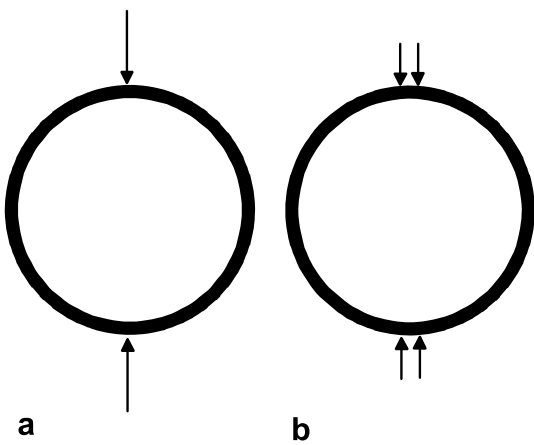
Two-point loading and four-point loading on the liner. (a) Two-point loading and (b) Four-point loading.
